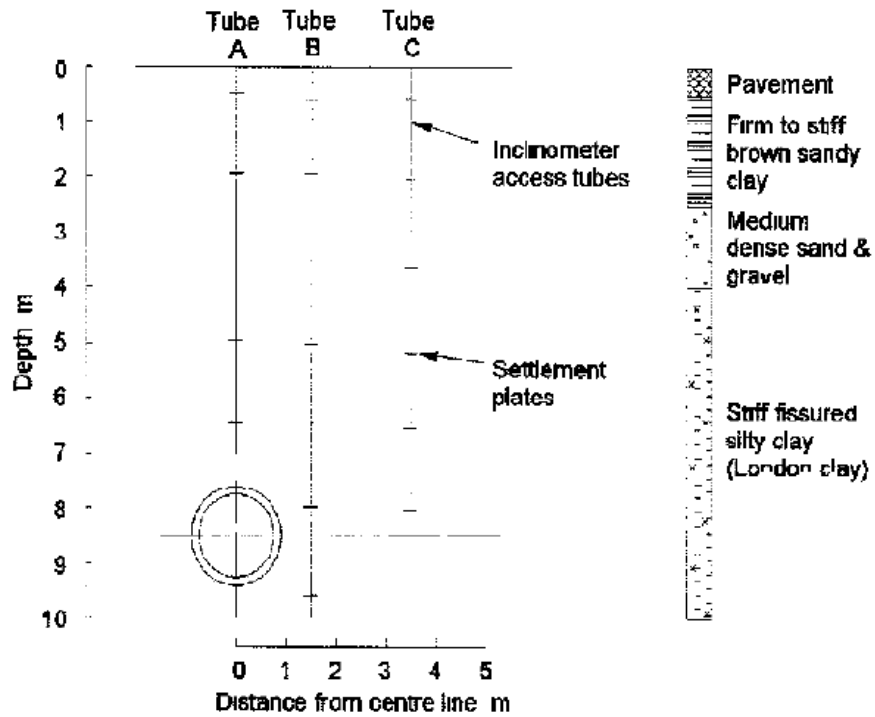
Instrument Arrays at Site 6 (Marshall, 1998)
